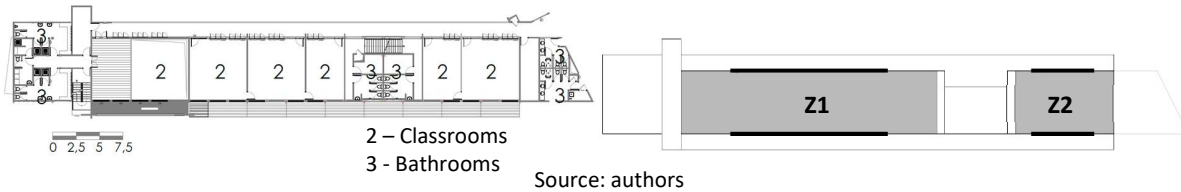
Floor plan and Thermal Zones (Building B-AP)
